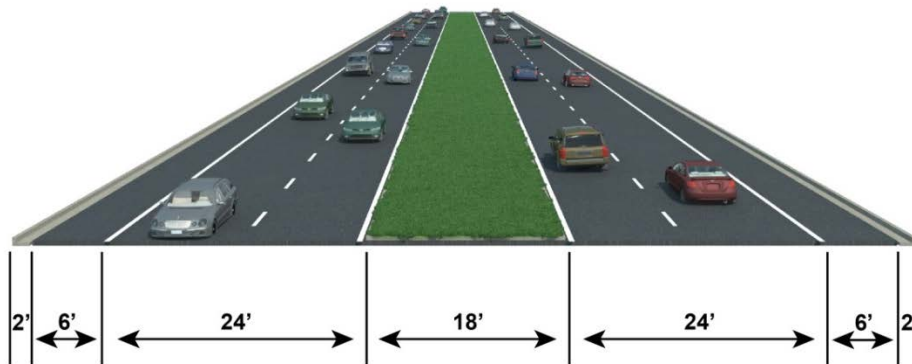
Conceptual Typical Section for the US 41 Raised Median Improvement
